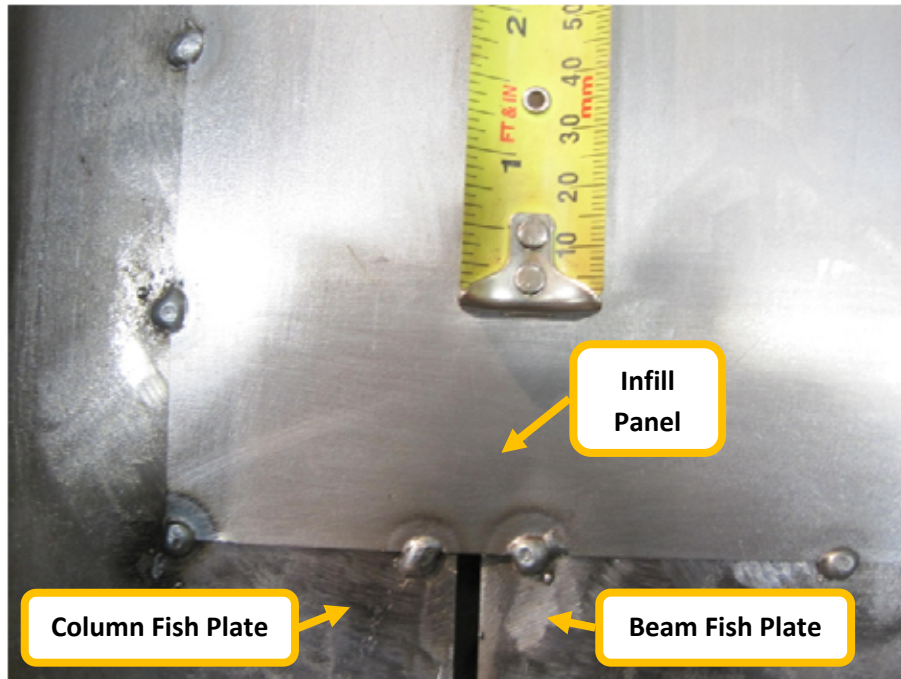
Tack Welds at Typical Corner Detail
